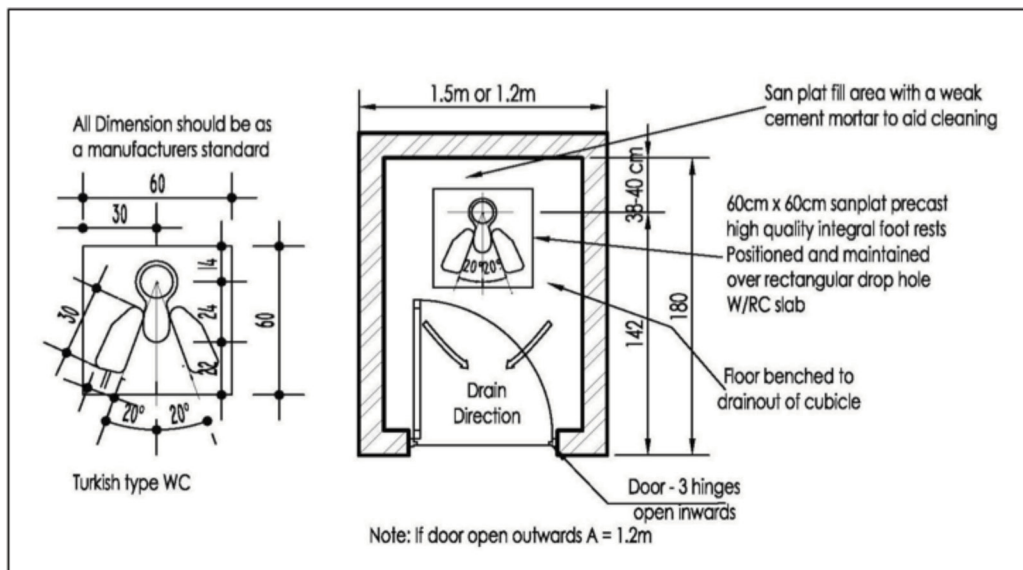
Interior and Squatting Plate (door opens inwards)
